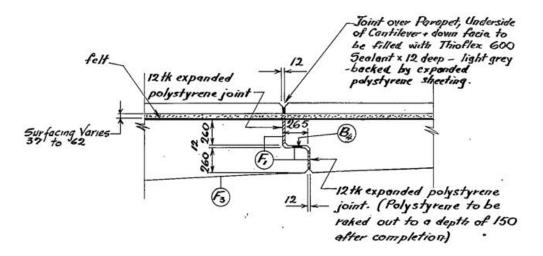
Expansion joint at half-joints (Extract from Record Drawing ER6D/S73/1)
